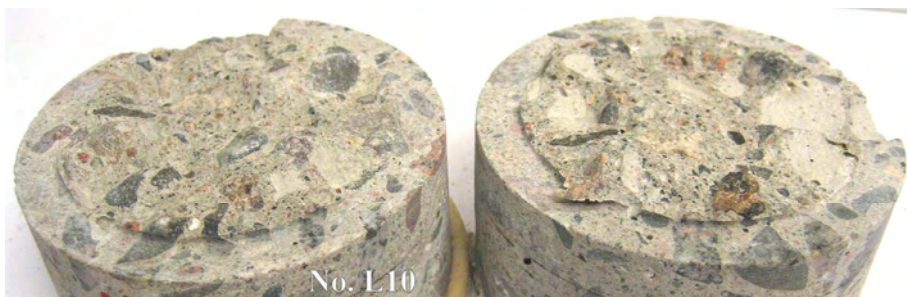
Photograph showing the failure surface for test No. L10 after fatigue test. A part (1/7) of the notch has loosened.
